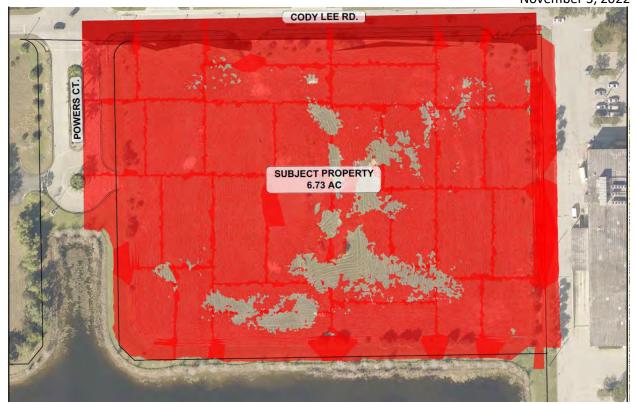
Areas on Southeast Parcel where Current Elevation Exceeds Control Elevation
